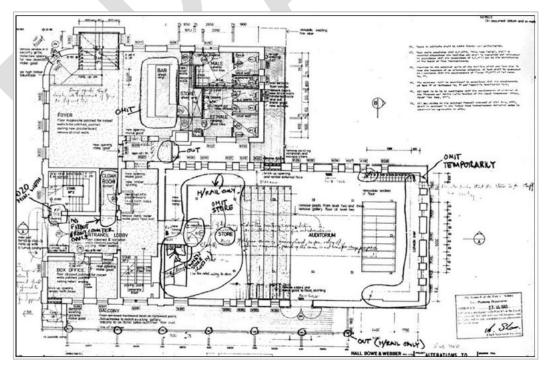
Amended Ground Floor plan, approved in 1983, showing the proposed amendments or "omissions". (Source: City of Sydney Archives 539/1/82)
